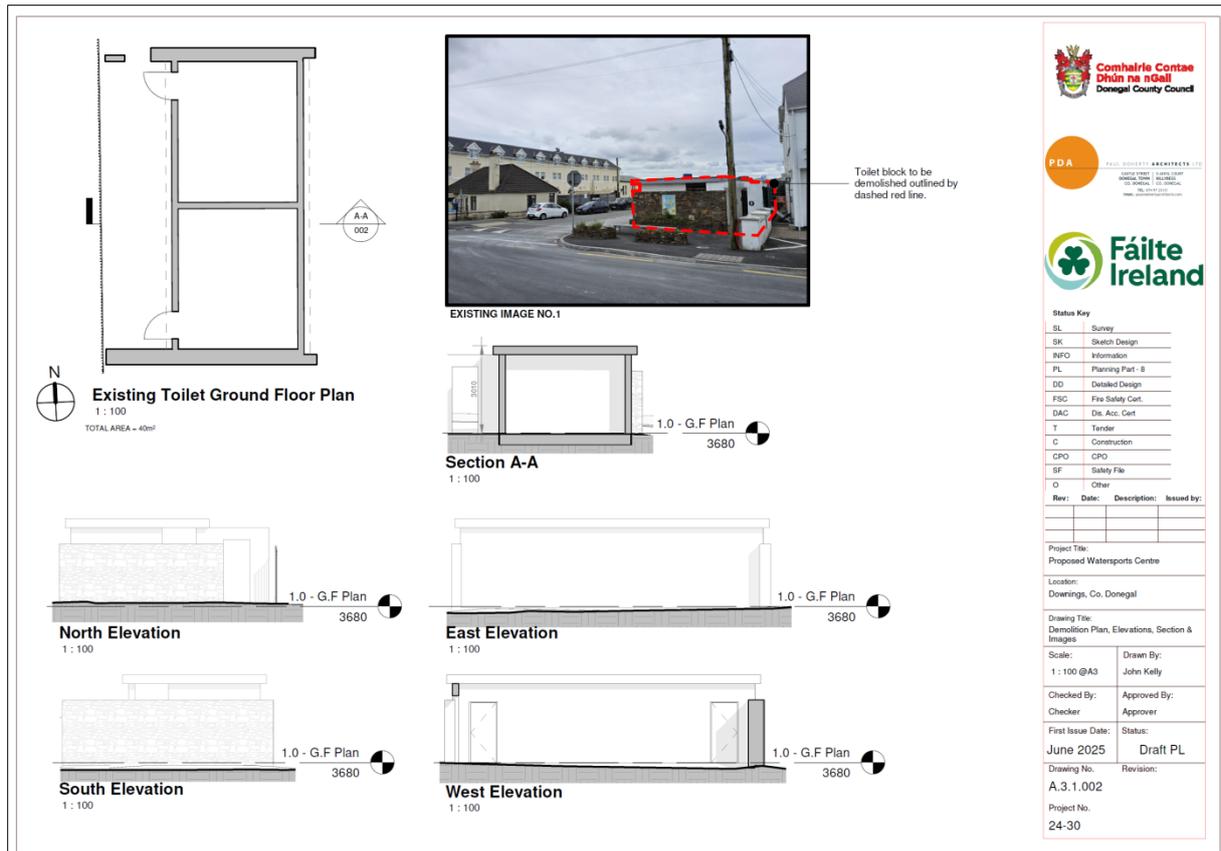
Existing Toilet Building to be demolished as supplied by Paul Doherty Architects Ltd. (Not to scale).
